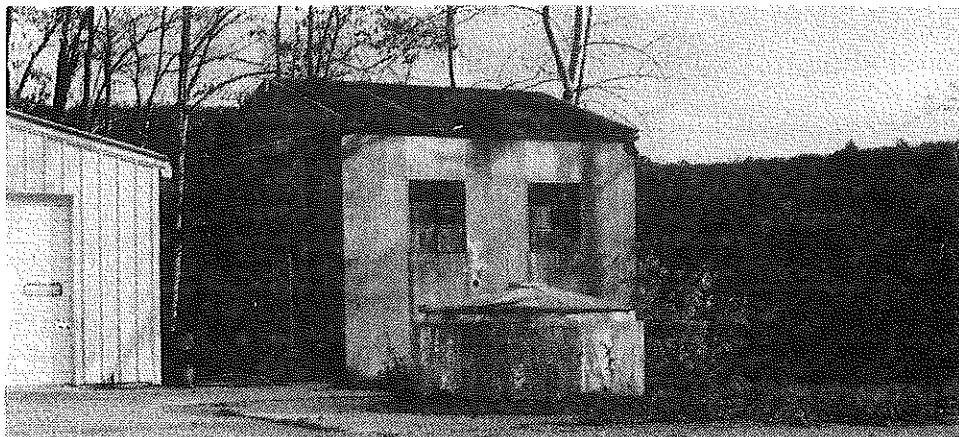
Waste Storage Building and Retention Tank (1980 photo)
